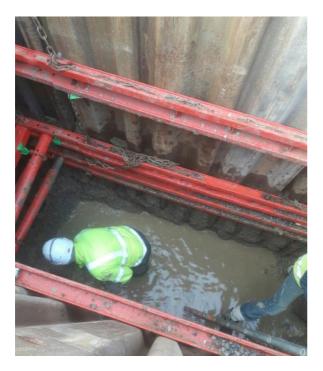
Sheets and walers for sewer trench Figure 18 – Manhole brace with access/egress
